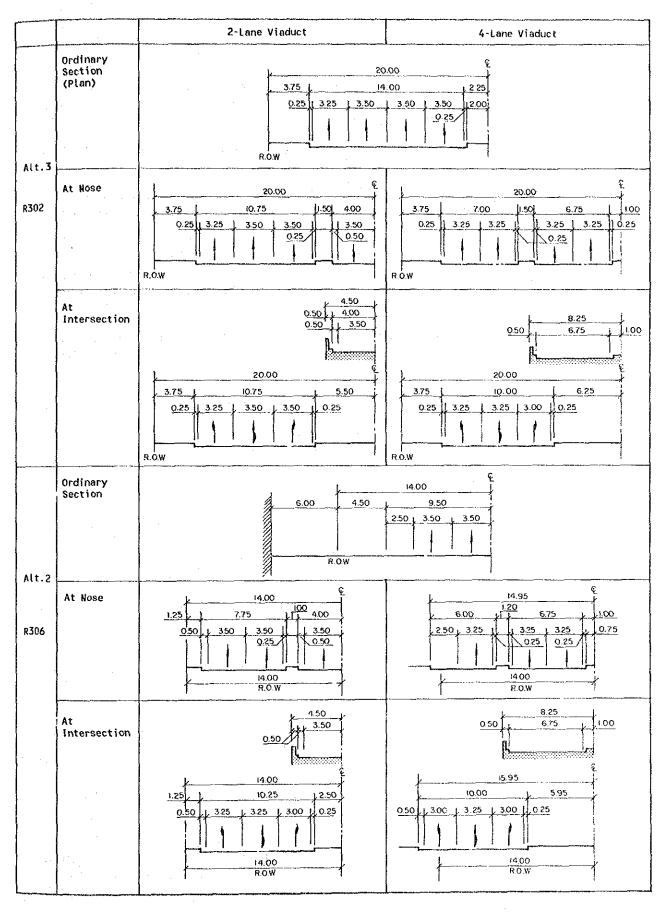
CROSS SECTION ELEMENT OF ALTERNATIVE PLAN
